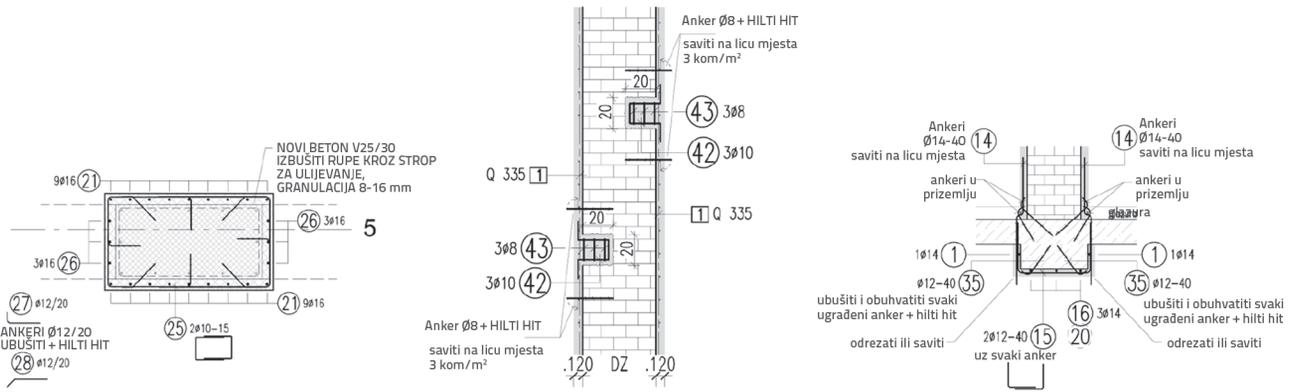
Characteristic details of the strengthening of the existing basement structure [12]
